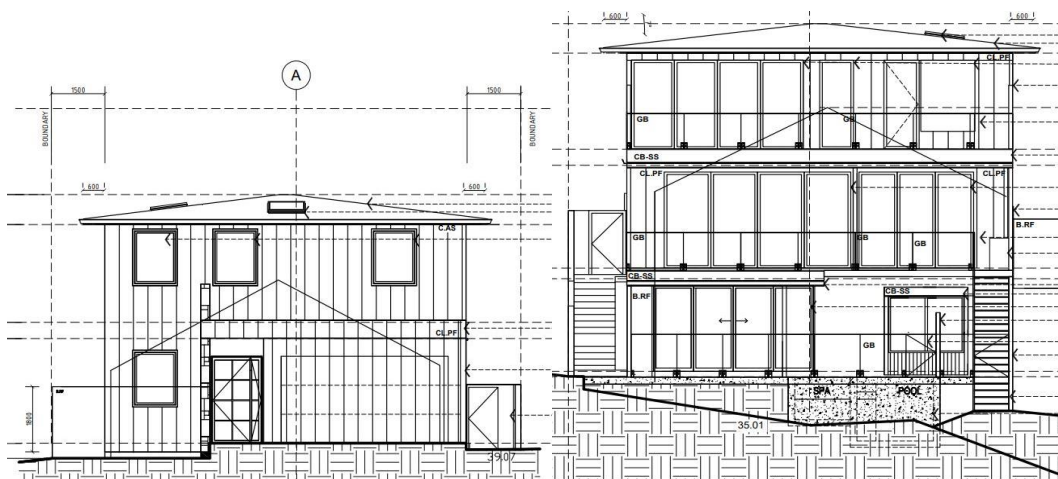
Western elevation & Figure 6: Eastern elevation (Source: Architectural plans)
